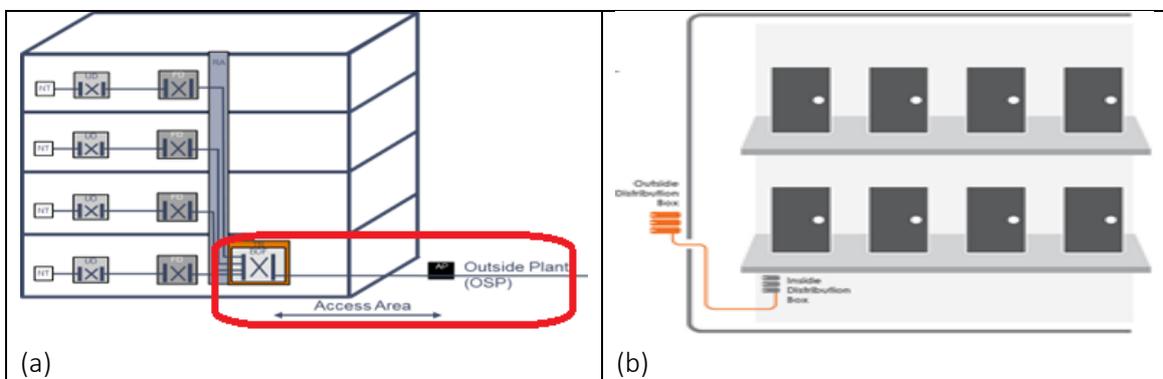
(a): Fiber cable entry point—OSP (Outside Distribution Box / Access Point) connection through the Wall / Access Area into the building.
